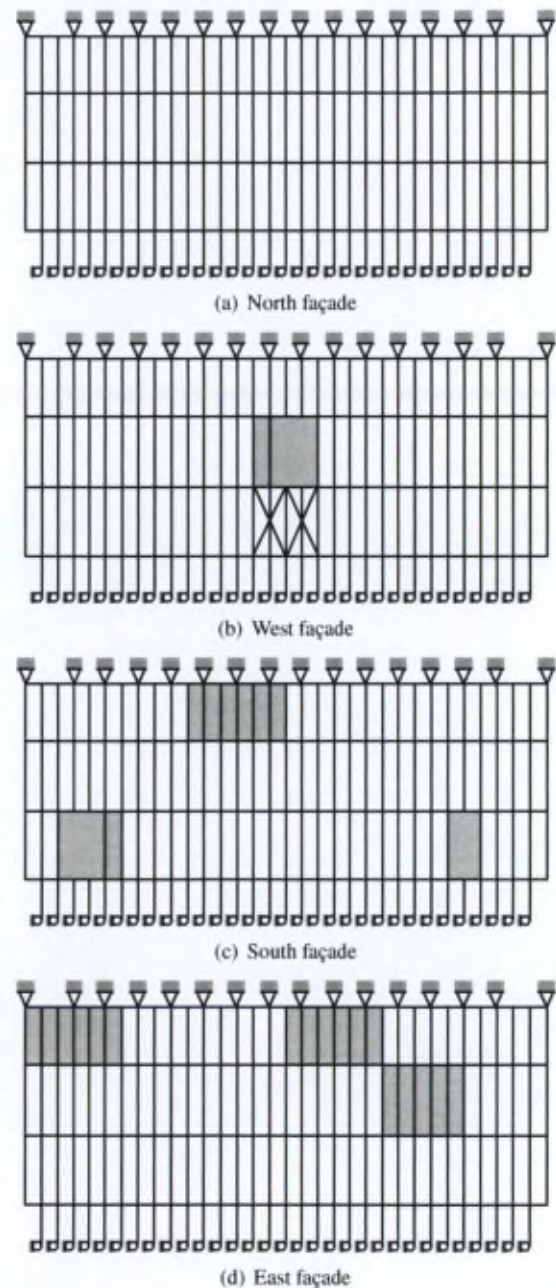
Simplified models of the four façades: the grey shaded areas represent zones where no bracing can be located. The bracing in the West façade (under the grey zone) are compulsory design elements
